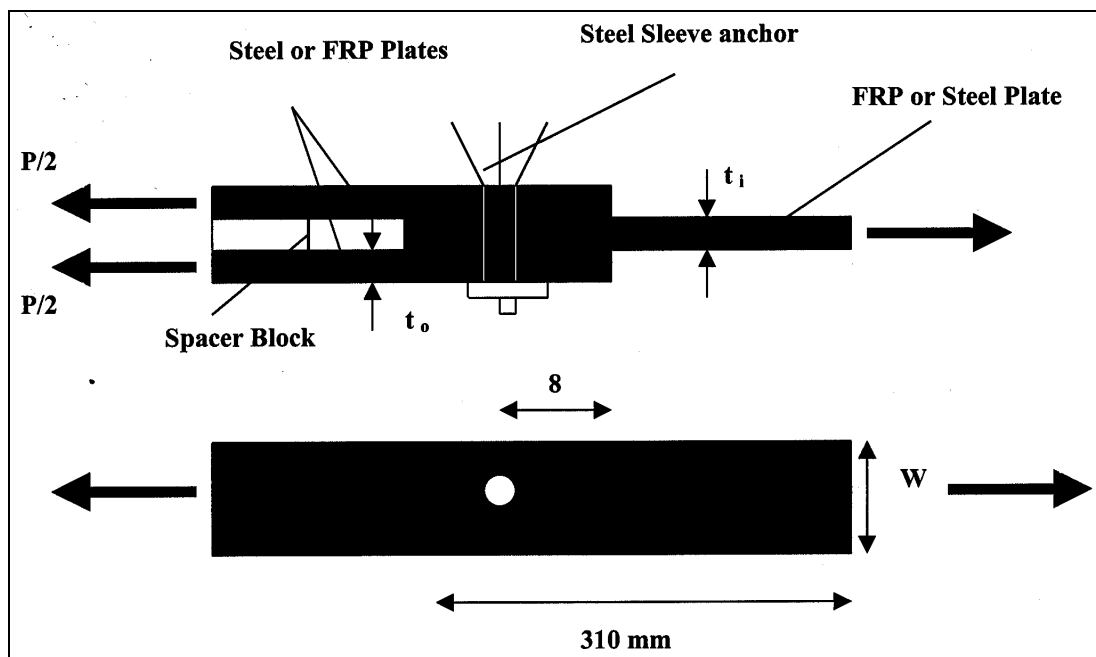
Setup of double-lap bolted joint with steel sleeve anchor connection.
